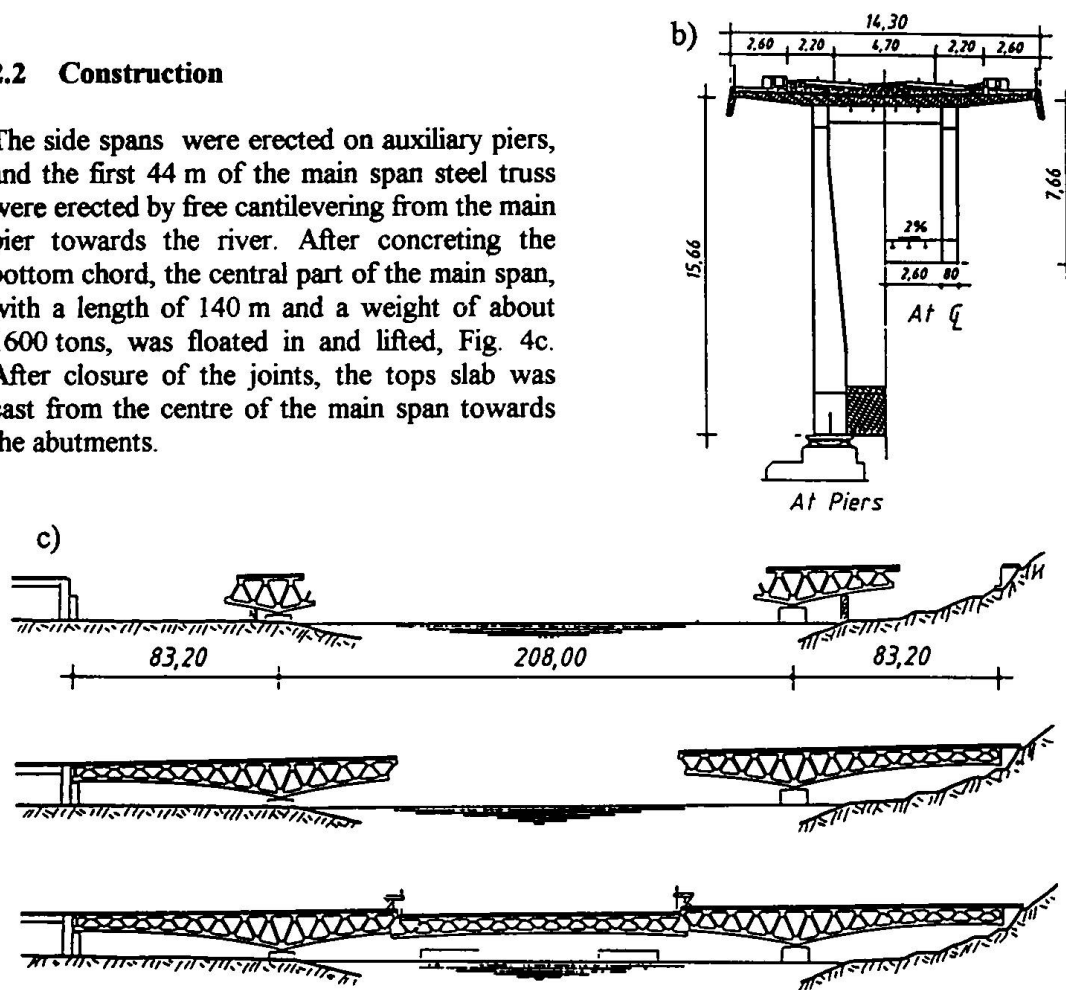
Railway Bridge across Main River at Nantenbach, Germany
